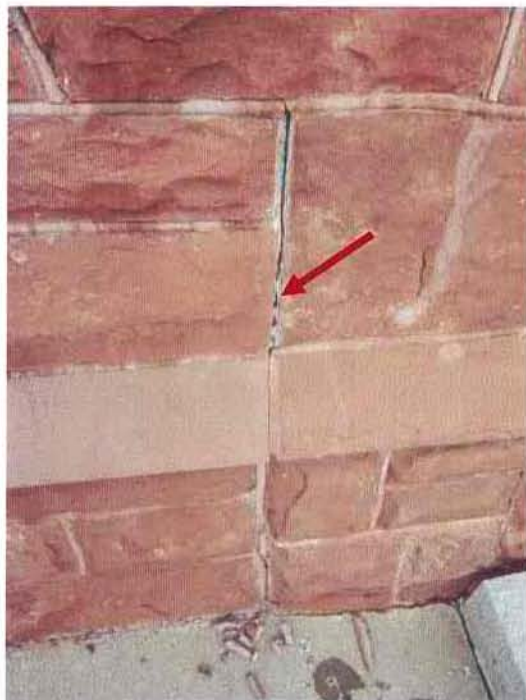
South façade sandstone building base – limited open joints at sandstone masonry.
